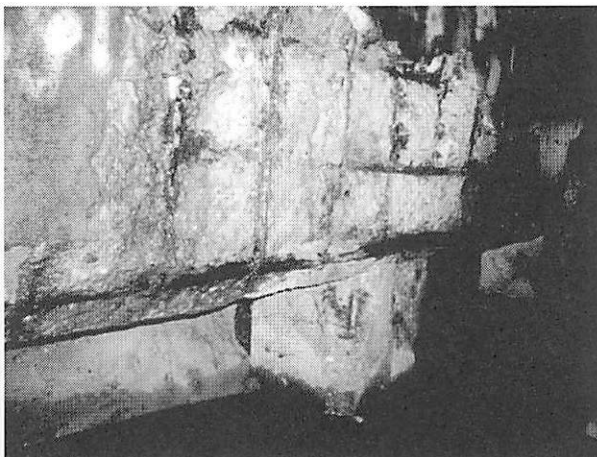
Severe corrosion inducing wide area of spalling
